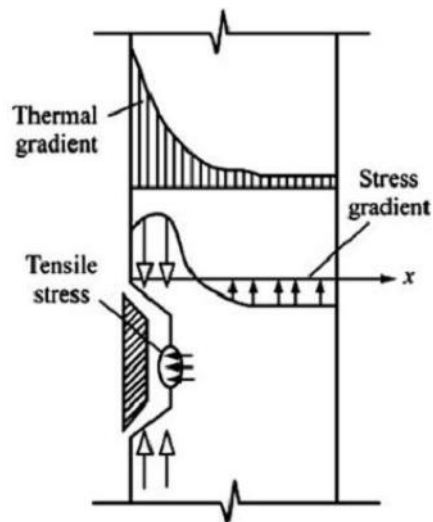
Mechanism of thermal stress spalling (Yufang Fu, 2010).
